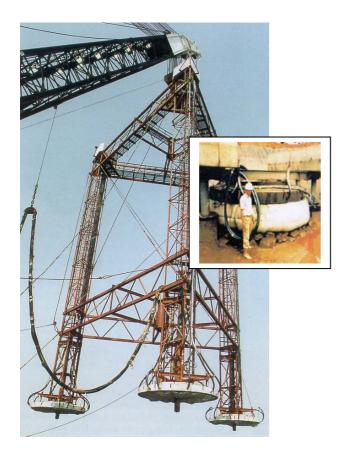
Grout Bag used as a Foundation Leveling Pad
